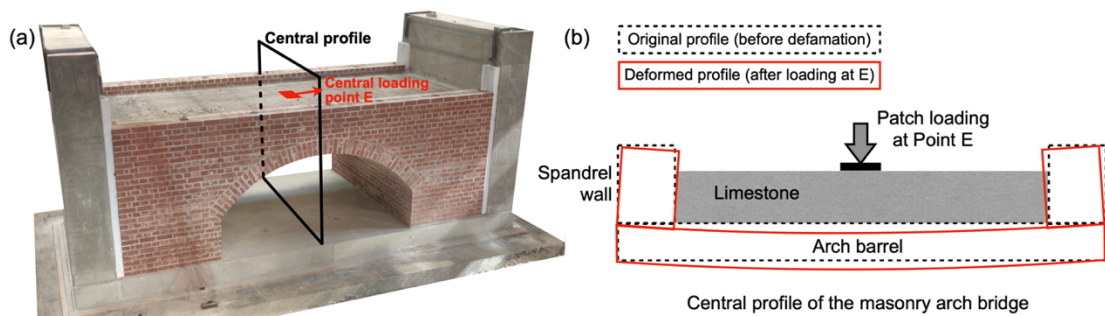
Deformation mechanism of the masonry arch bridge at Test 5.
